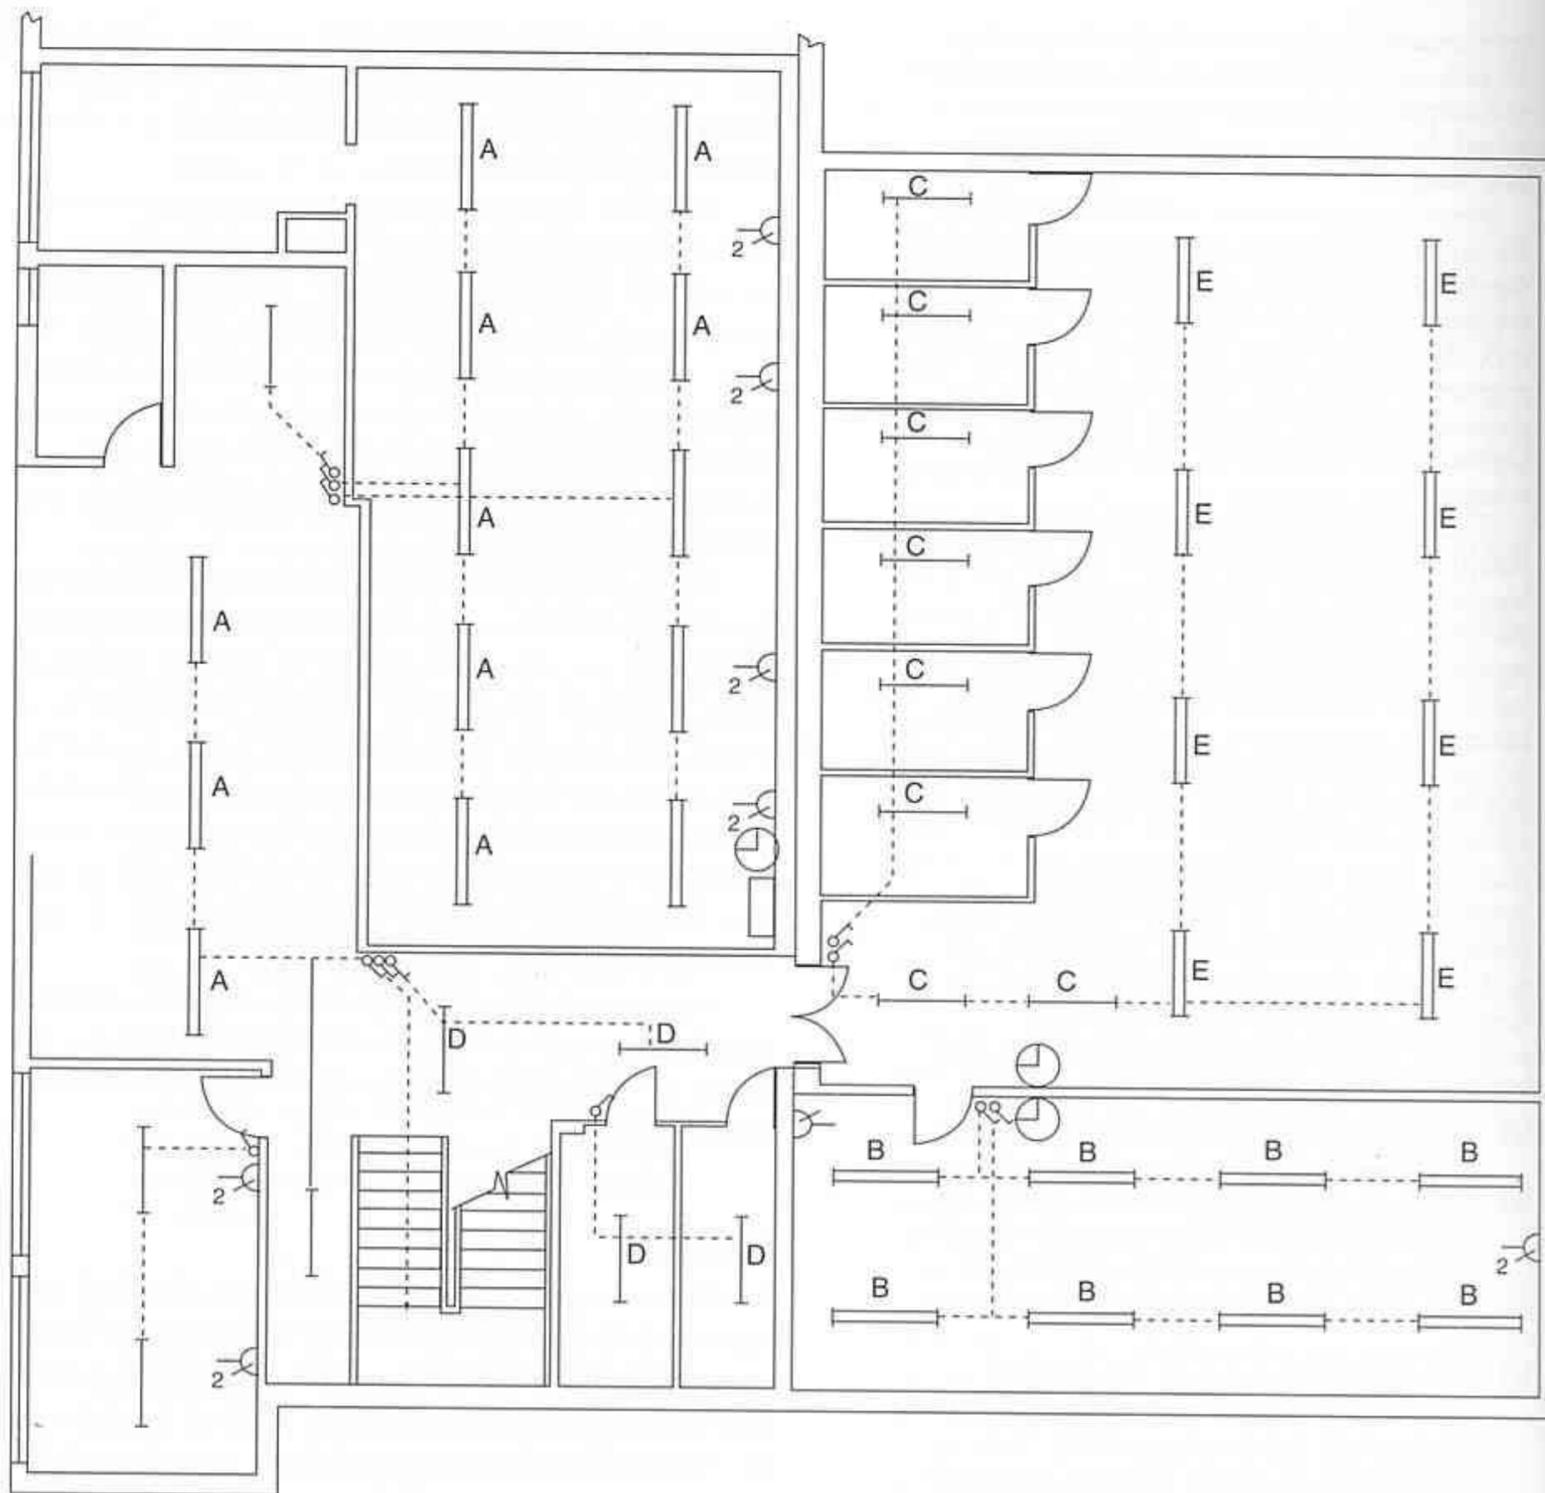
(a) Layout plan for electrical work (light and power additions to storage area) TAFE COMMISSION, NSW
